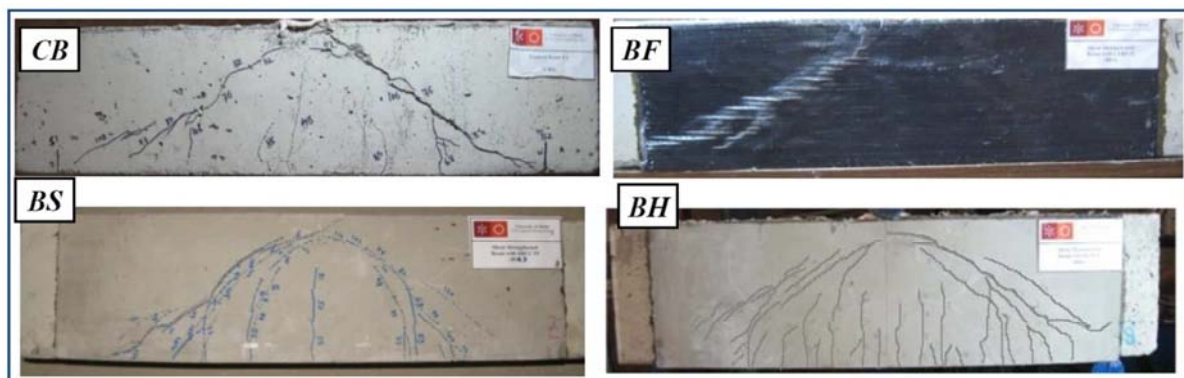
Typical cracks pattern and failure modes of the beams, CB=Concrete Beam, BF=Beam with CFRP sheet, BS=Beam with SHCC, BH=Beam with HPC [36]
